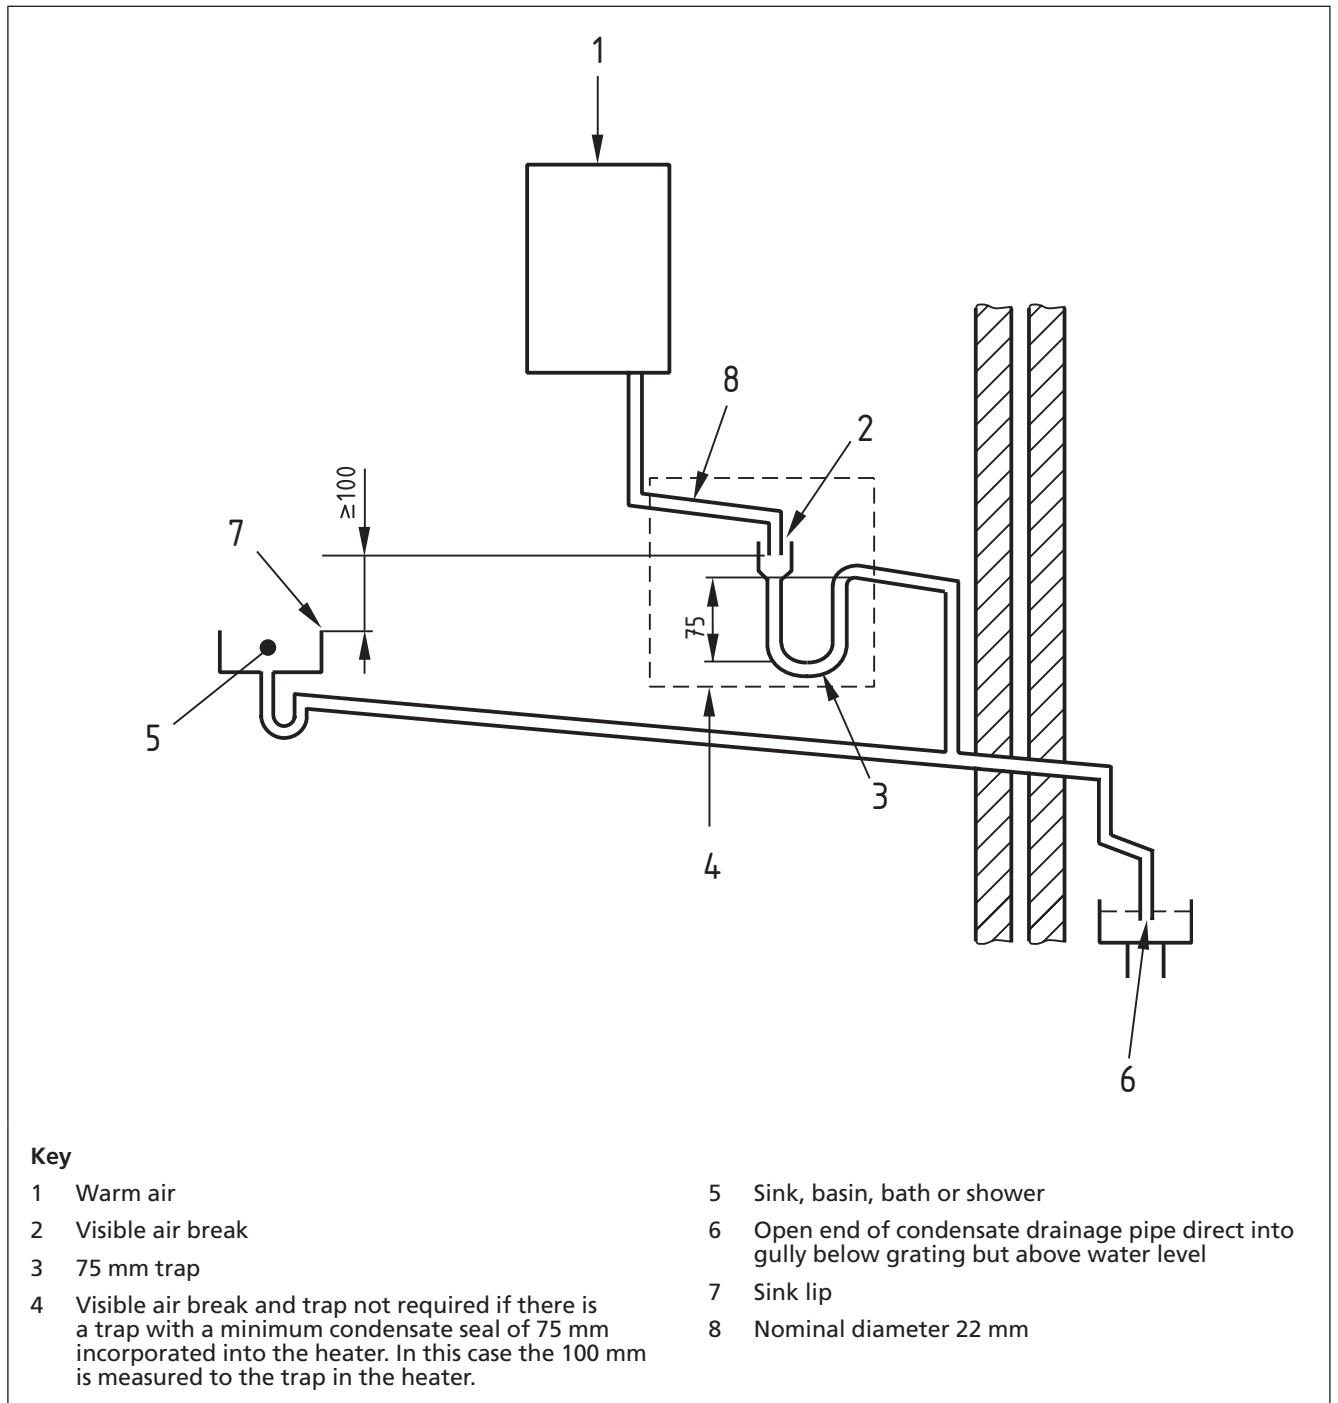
Connection of a condensate drainage pipe upstream of a sink, basin, bath or shower waste trap
